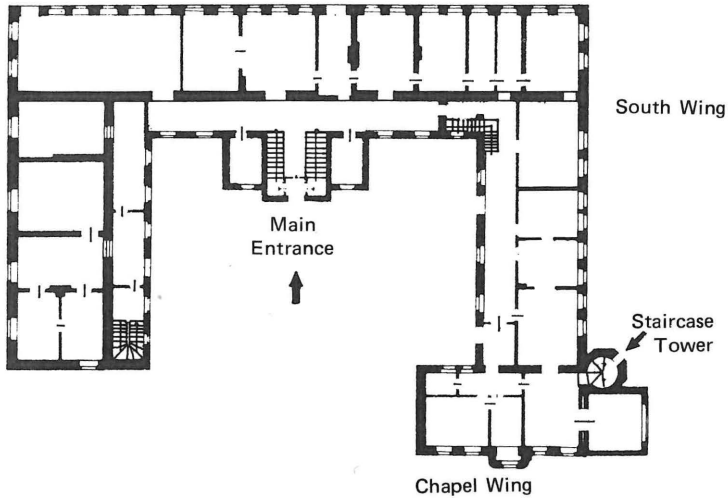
Ground Floor Plan of Reinbek Mansion 1 : 500
